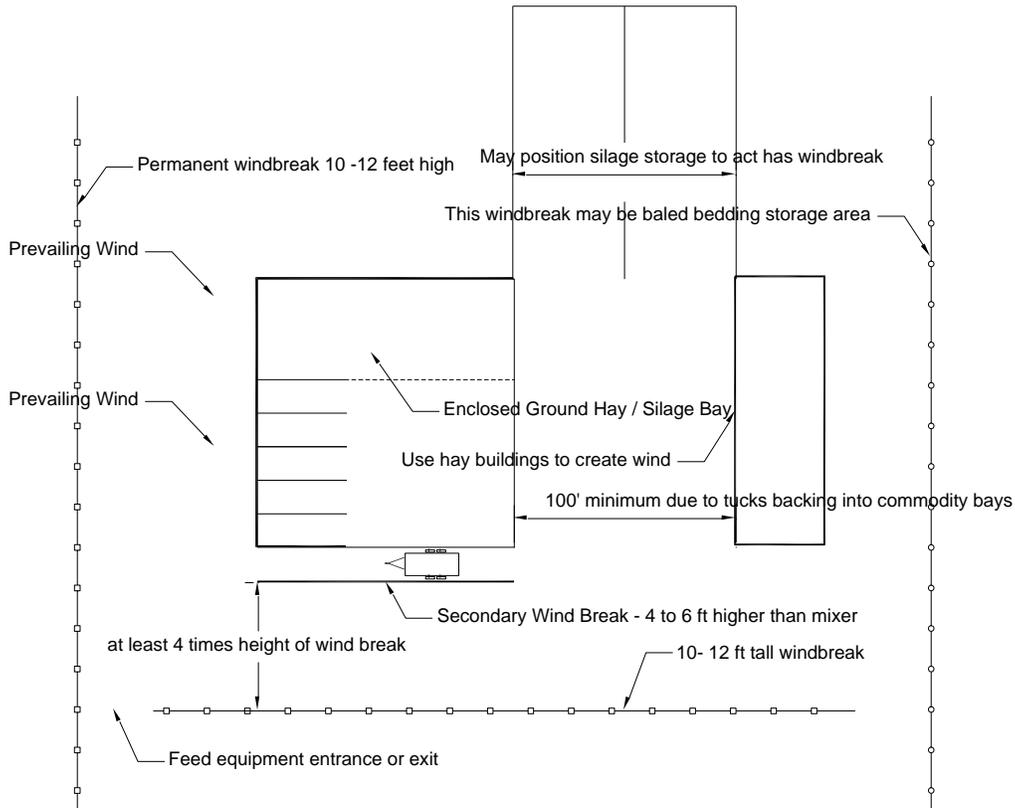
Utilization of buildings and windbreaks to minimize shrinkage due to wind
